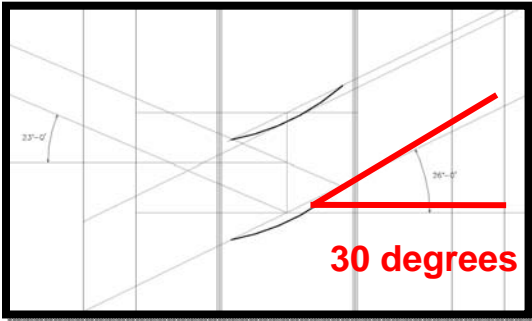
Daylighting strategy for low ceiling, south facing, small spaces – blinds-between-glass
